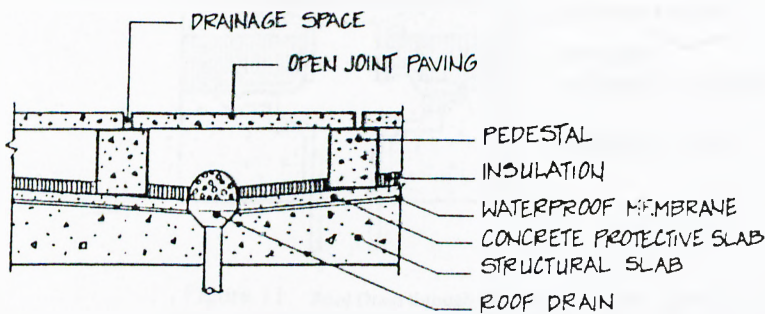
Subsurface Drainage for Paving on Pedestals. Pedestal-mounted, removable, open-joint paving provides positive drainage, adjustable heights, and easy access to the roof surface for cleaning or repair. Insulation is fitted between the pedestals.
